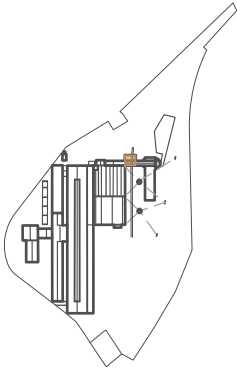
Gradings of significance: Ash Handling Tower plans.
